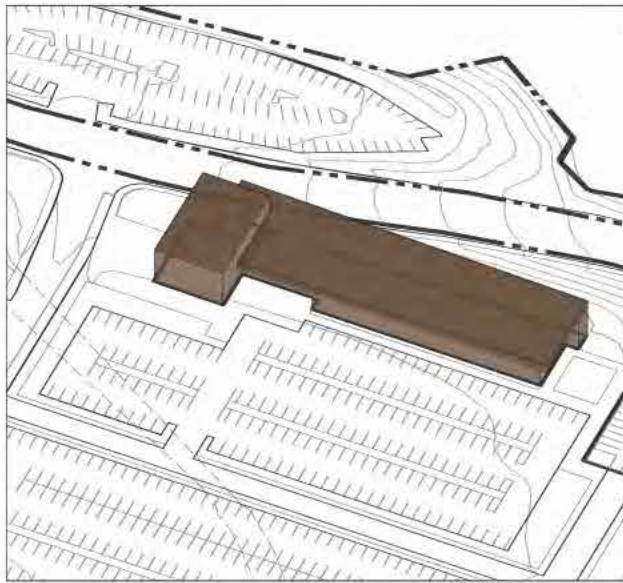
Axonometric and Site Plan of new Cosmetology building
